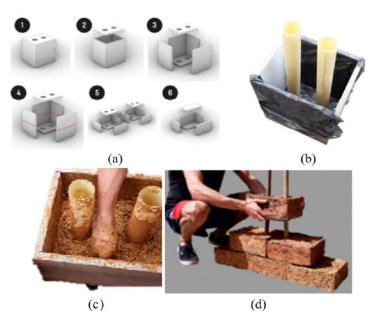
3D exploded model of the mold (a). Mold (b). Manufacturing of S-CEB (c). Assembly of the constructive system made with S-CEB (d).
